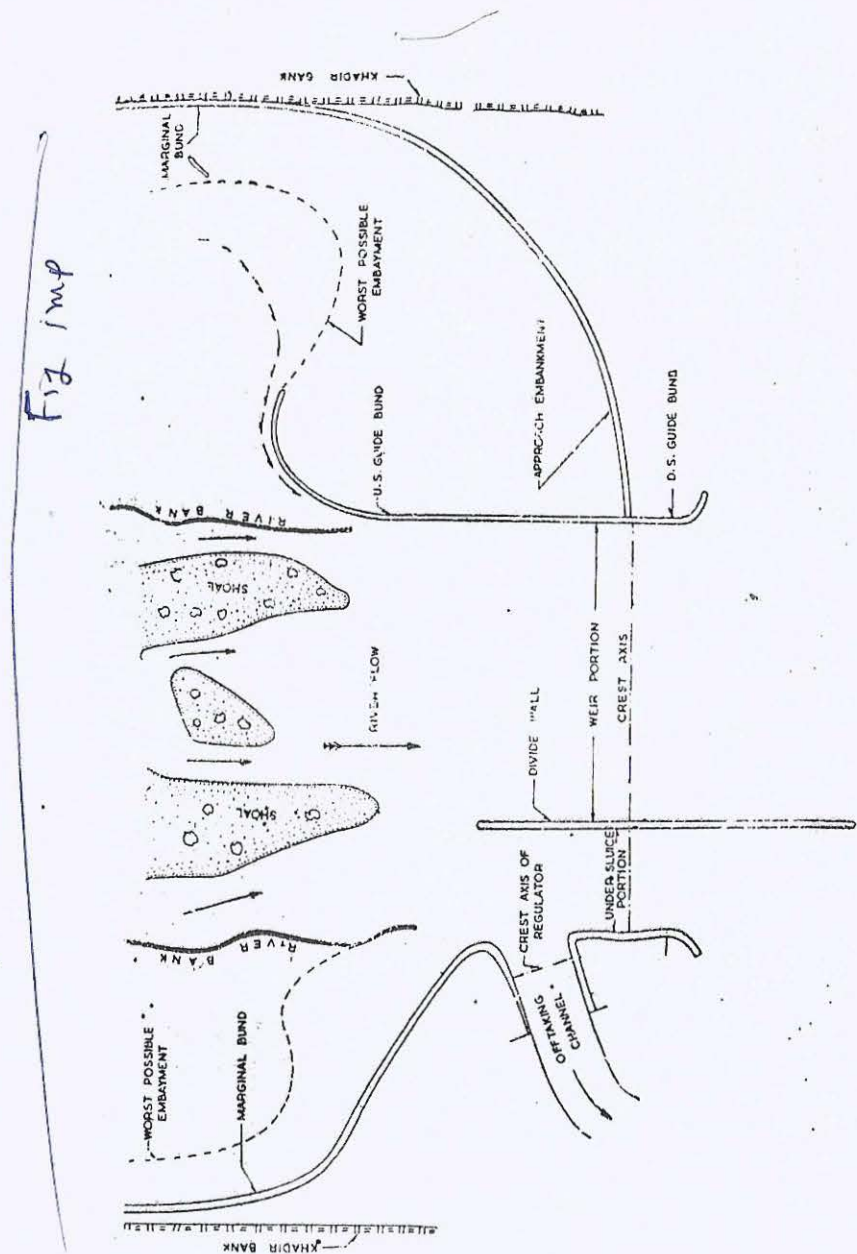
Layout of barrage in relation to approach embankment, off take channel and worst embayment
